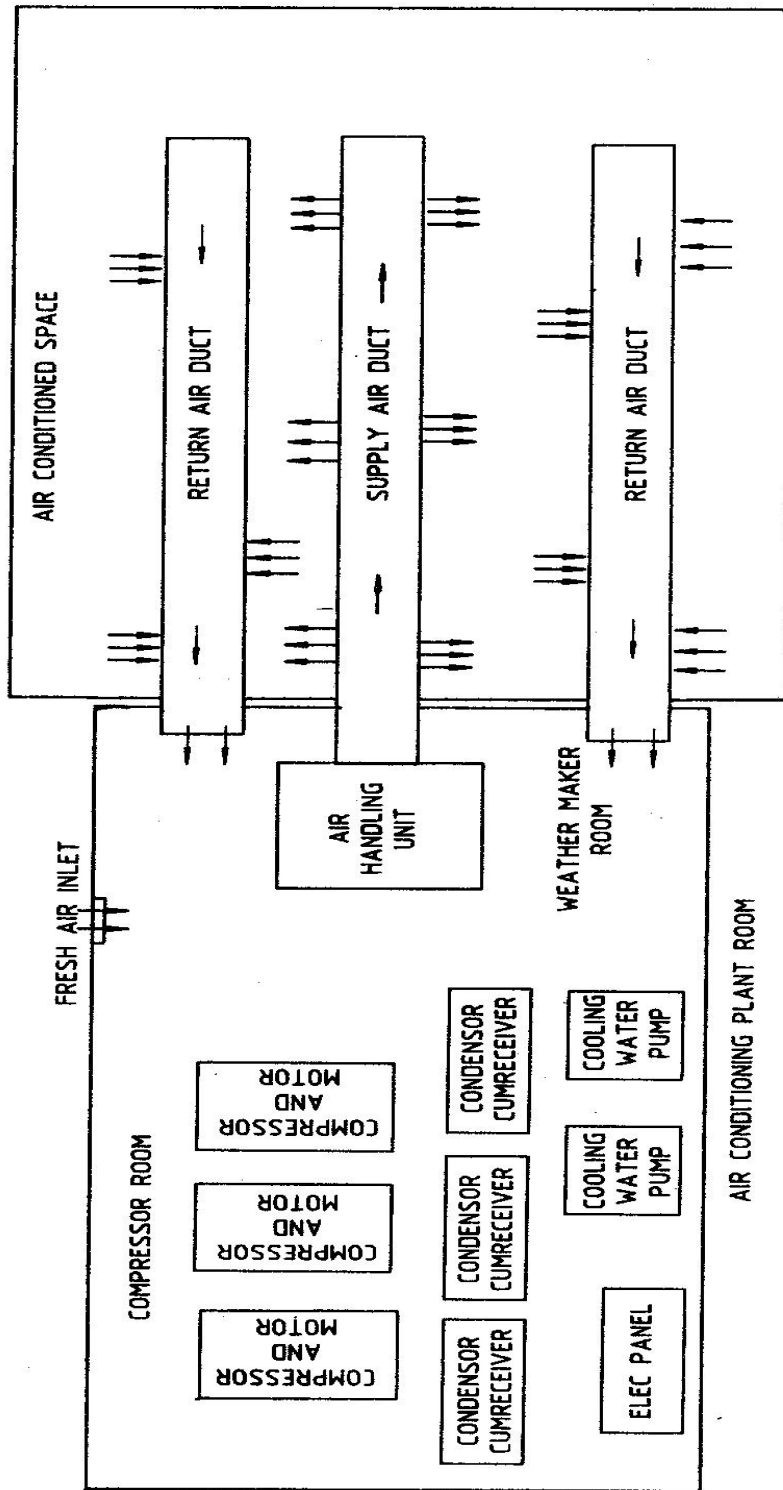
TYPICAL CENTRAL AIR CONDITIONING PLANT
